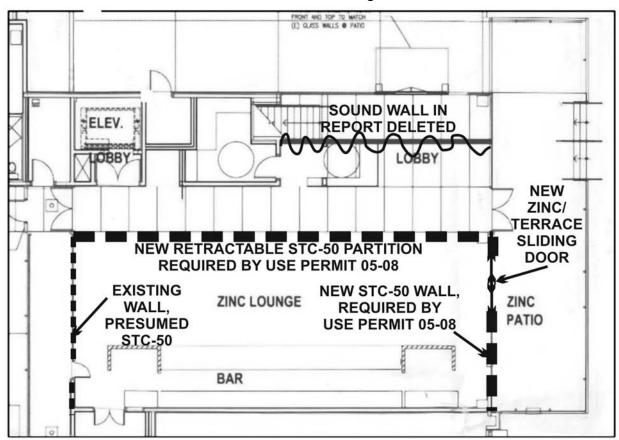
### EXHIBIT R-A: LAYOUT OF ZINC SOUNDPROOFING REQUIRED BY USE PERMIT RESOLUTION 05-08
